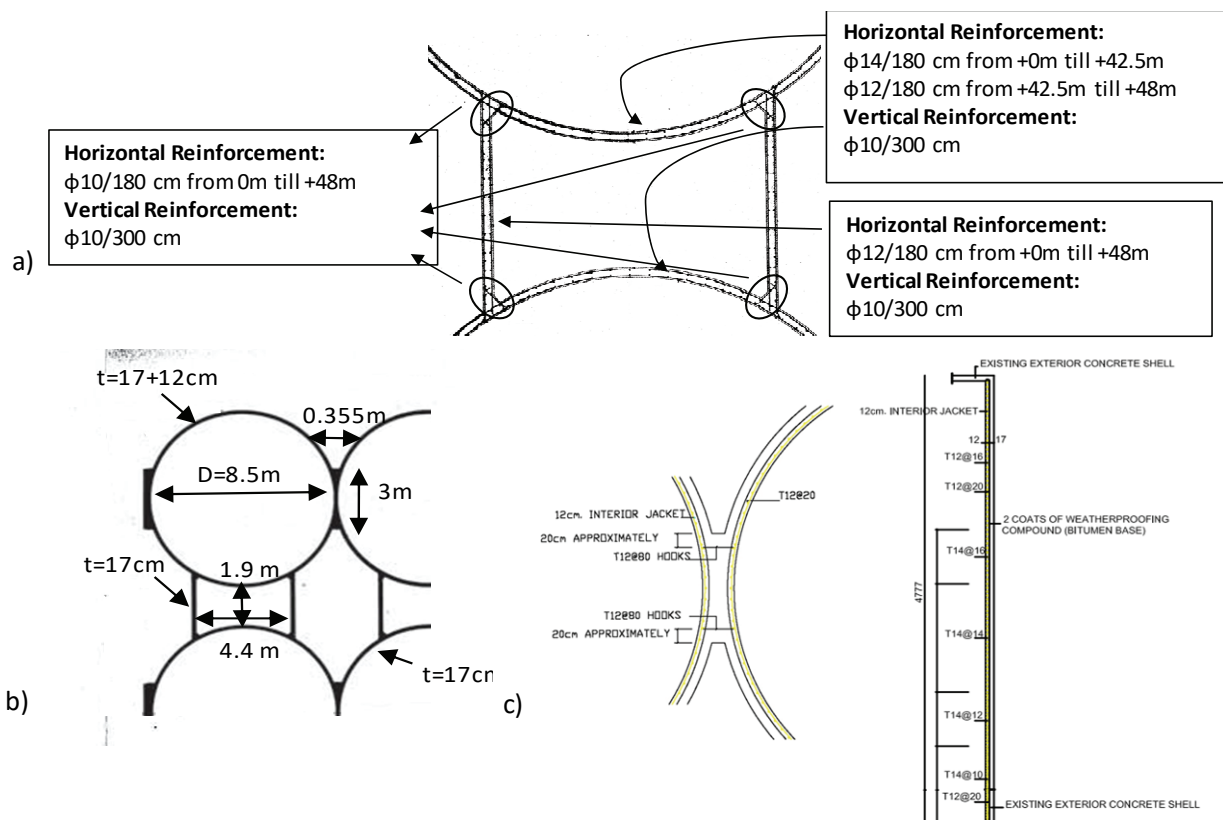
a) The steel reinforcement; b) the geometry and c) the concrete and steel restoration work of the silos
